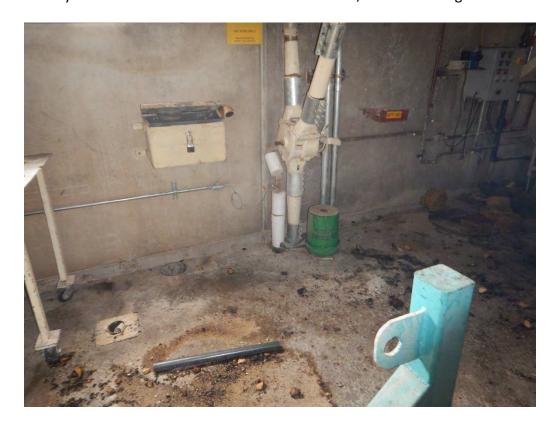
Mill B Wall Panel to Level 2 Slab Connection Failure Perspective
